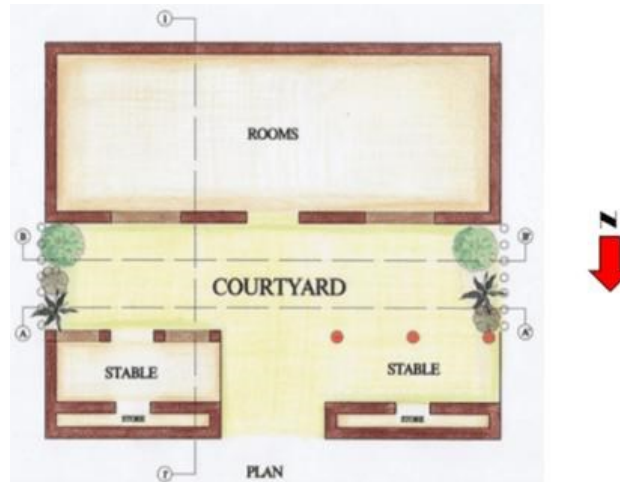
Detail plan of Ghannu Parasram Kamble's House 3
